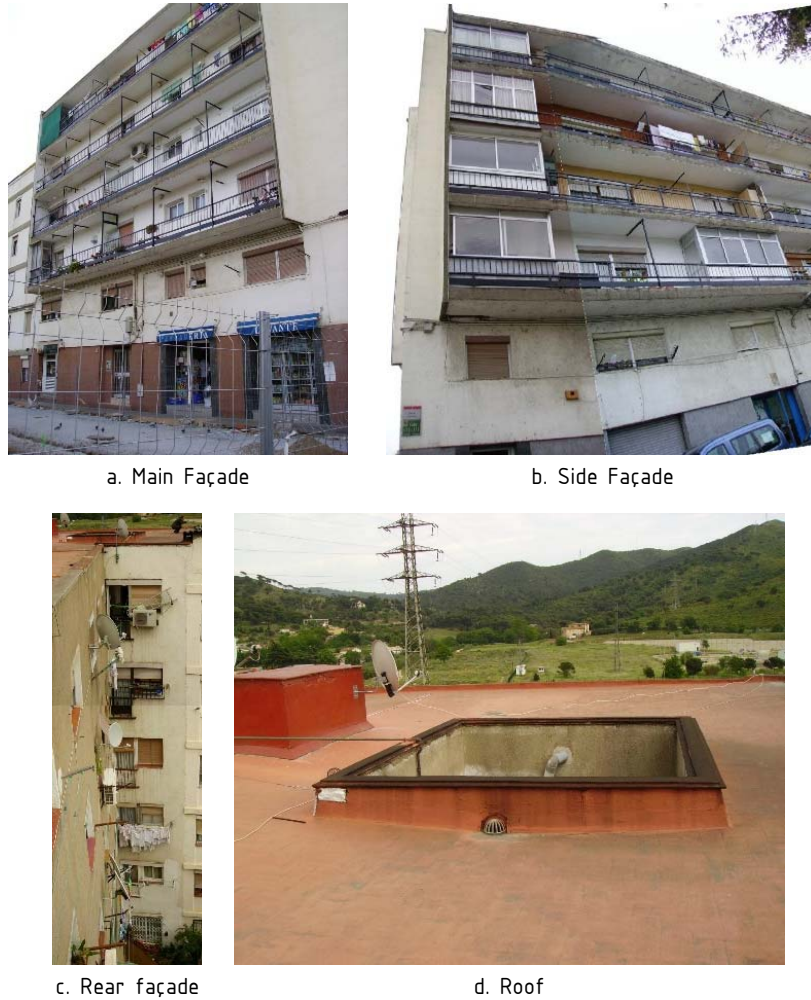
Overall view of the building case study façades and roof before energy retrofit work (2007).
